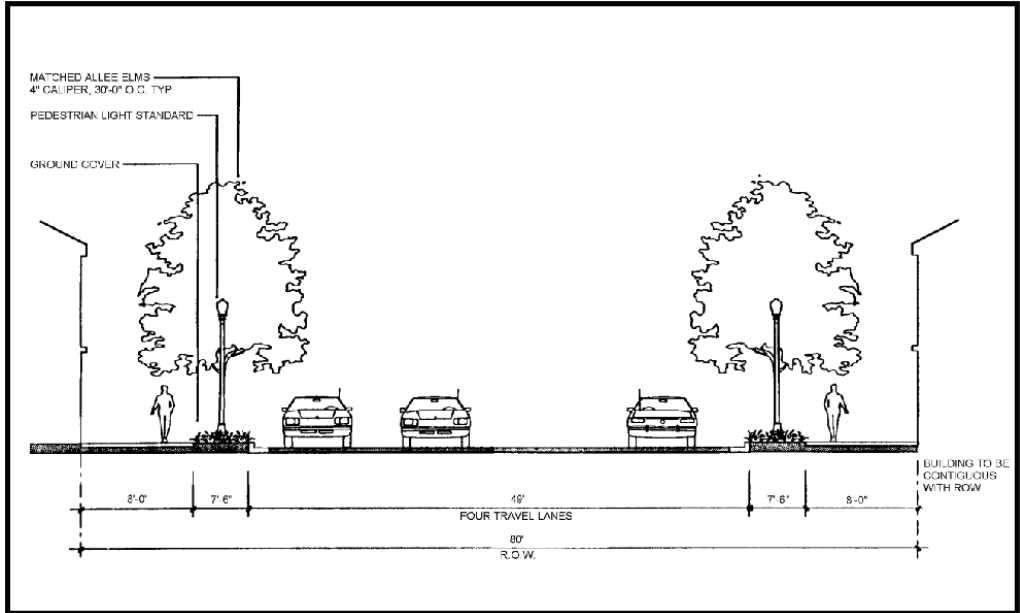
Bear Creek Parkway at Town Center (Undivided Cross Section)
